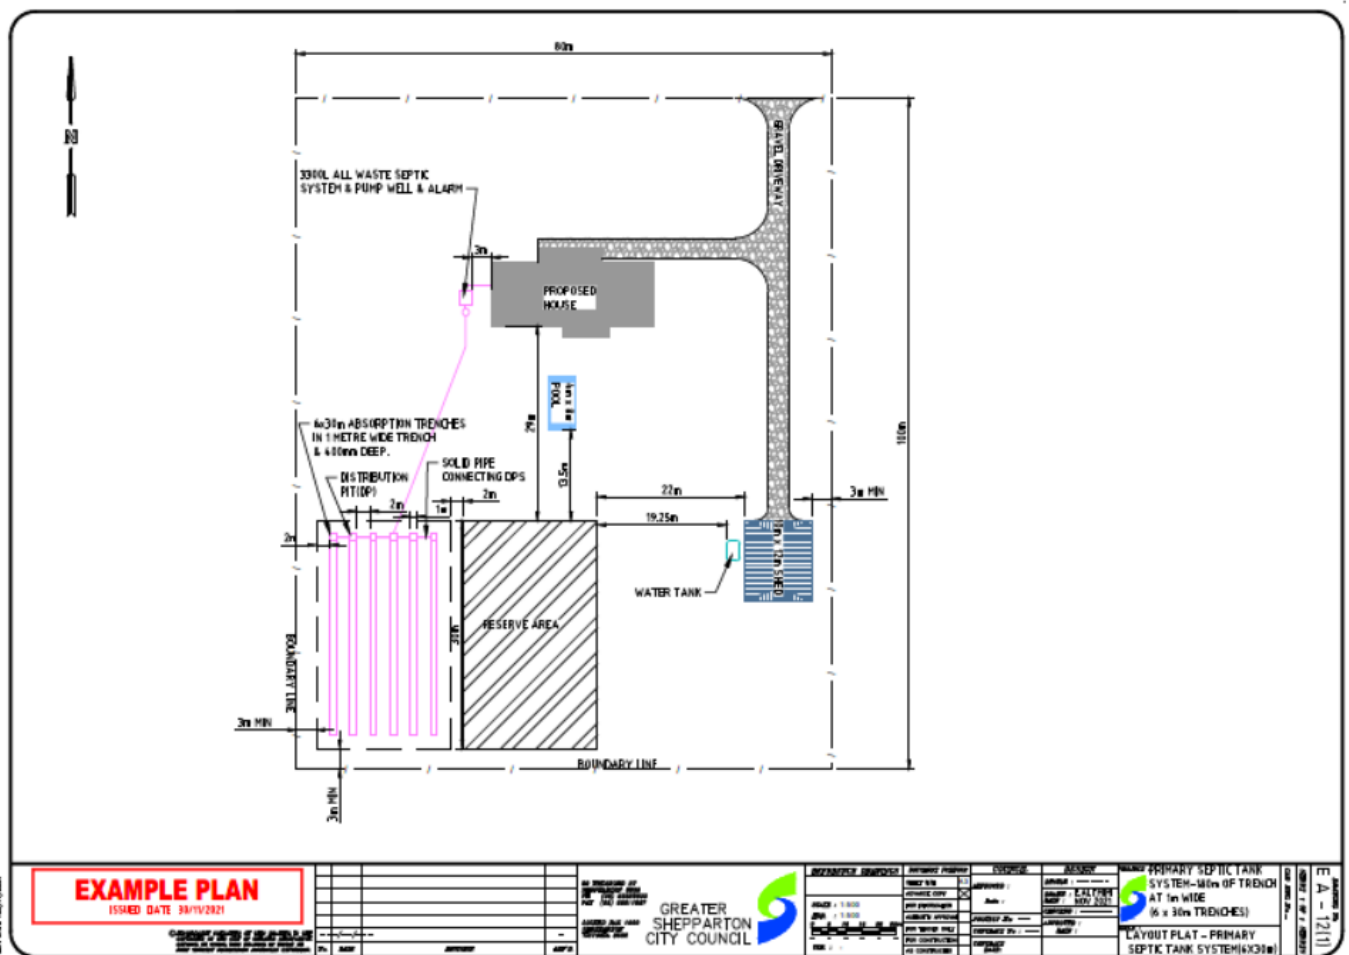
An example of a proposed site plan showing built structures, septic tank system and land required for effluent disposal
